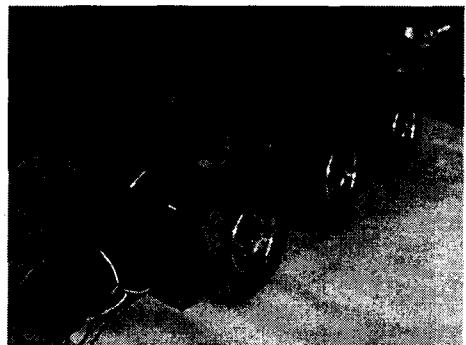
The cutting unit of projecting parts connects with interior parts of drainpipe
